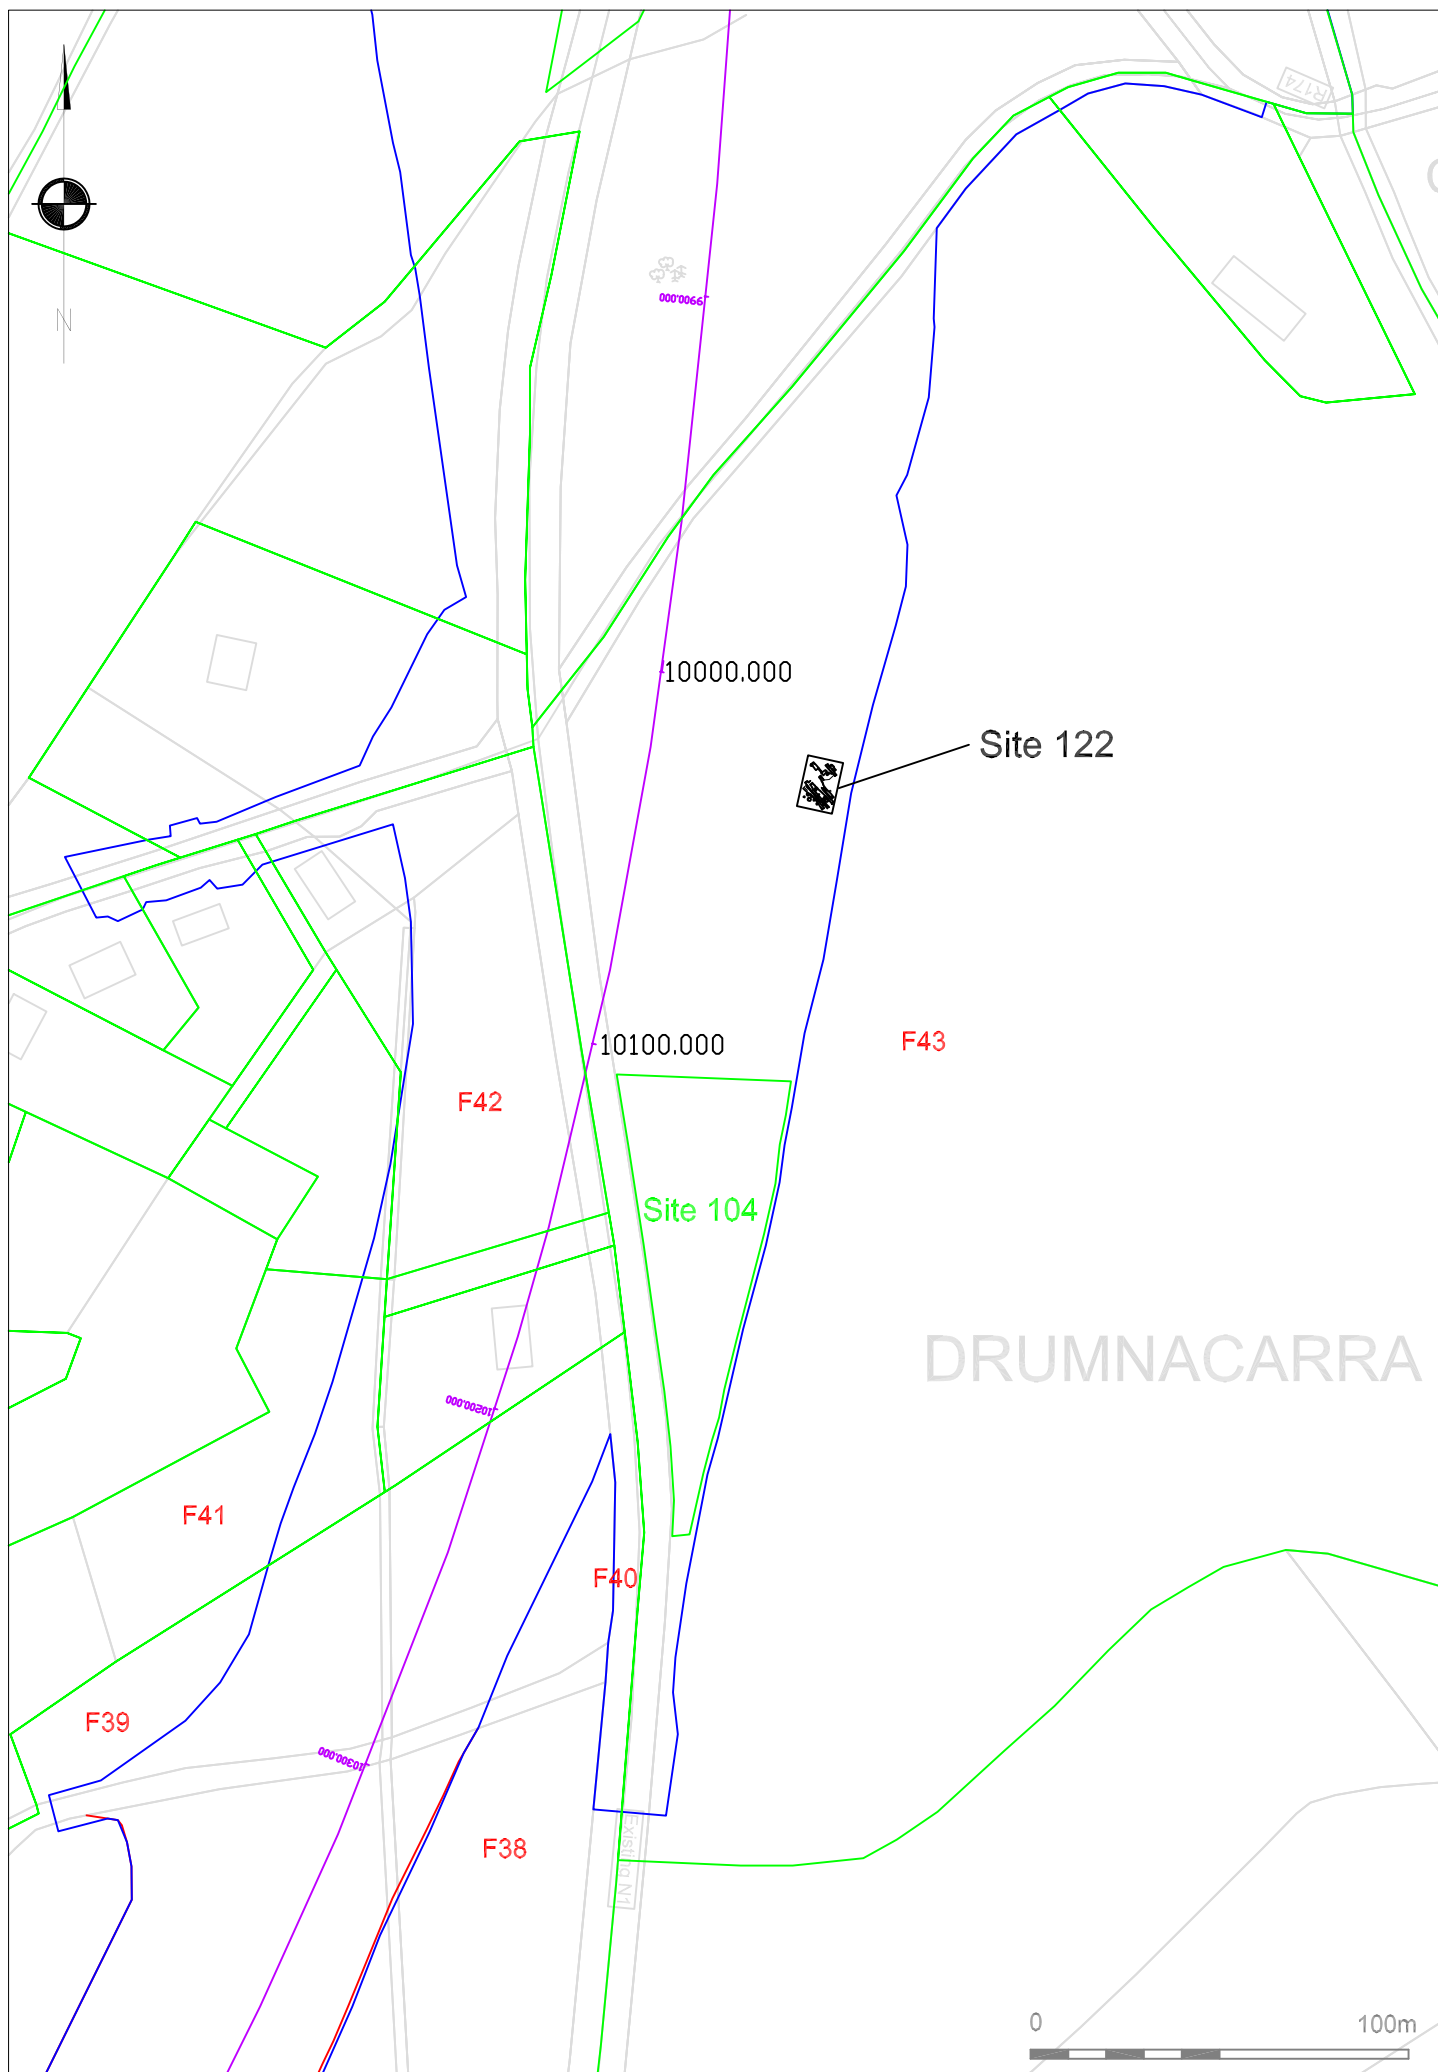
Plan showing Area 10 and Site 122. Scale 1:2000.
